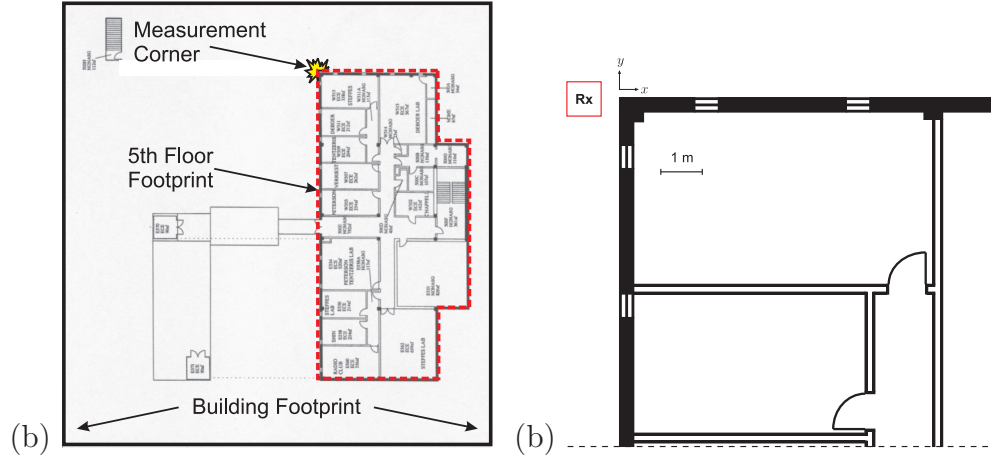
The 5th floor of Van Leer occupied a smaller footprint than the lower floors. This allowed access to the measurement site by way of the 4th floor’s gravel rooftop. Floorplans show (a) the entire 5th floor and (b) the portion of the 5th floor near the measurement corner.
